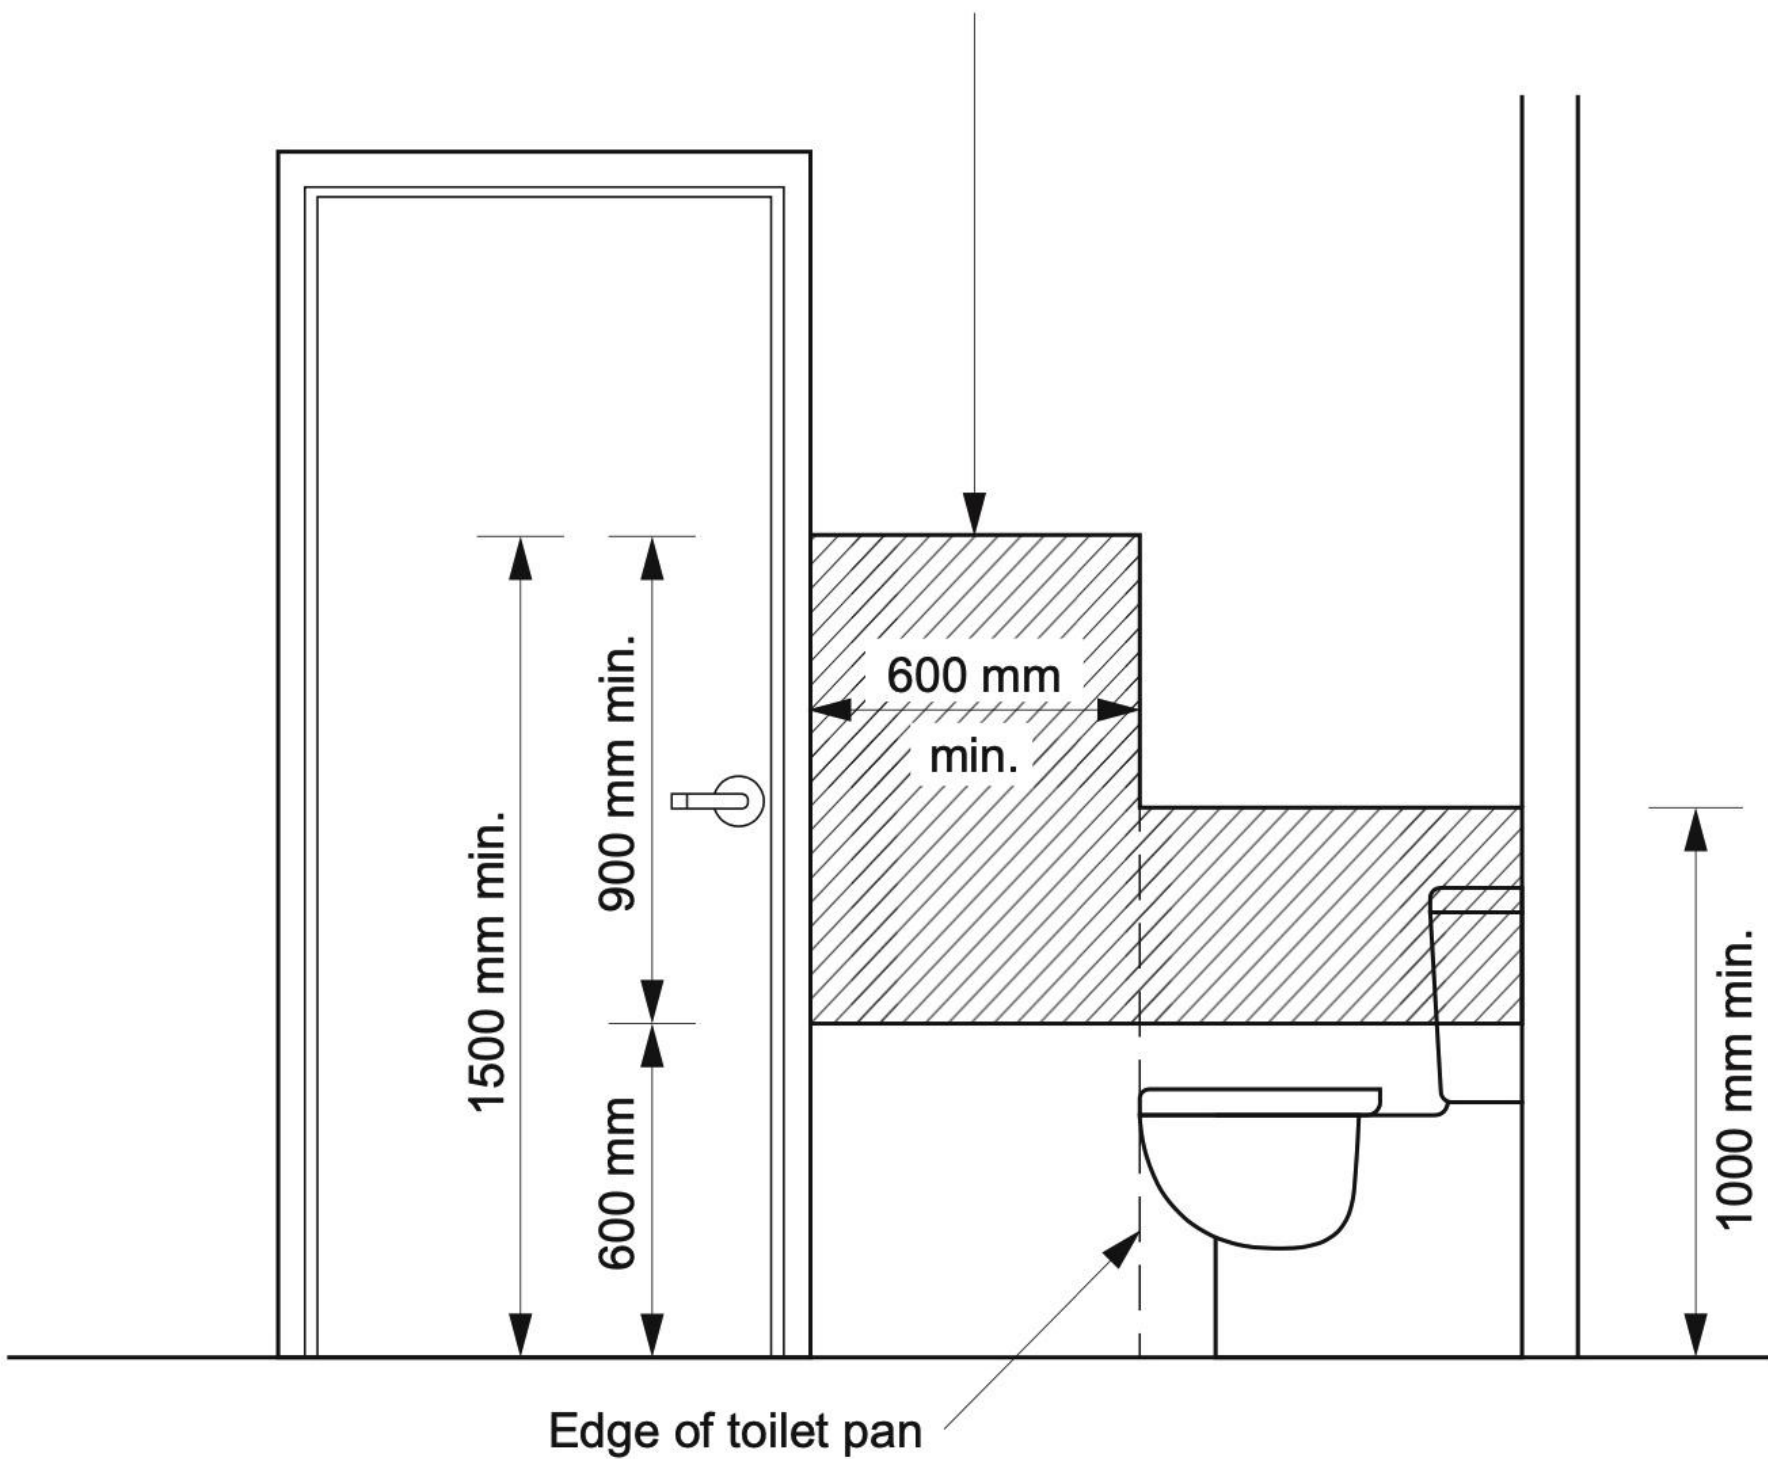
Minimum extent of sheeting for wall adjacent to a toilet pan
